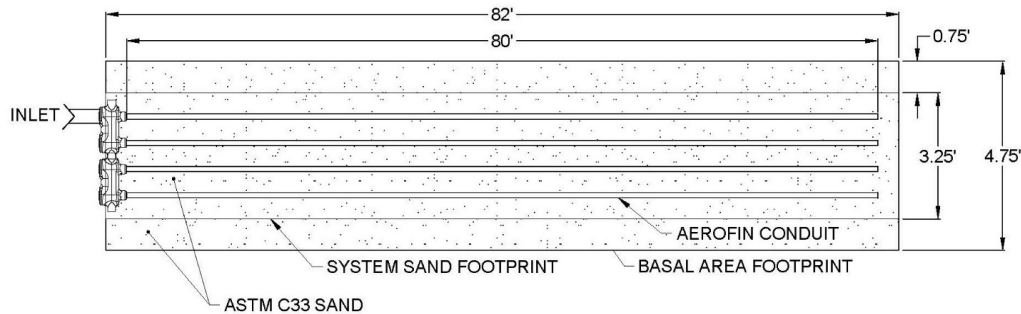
Detailed plan-view of an example in-ground AeroFin System
